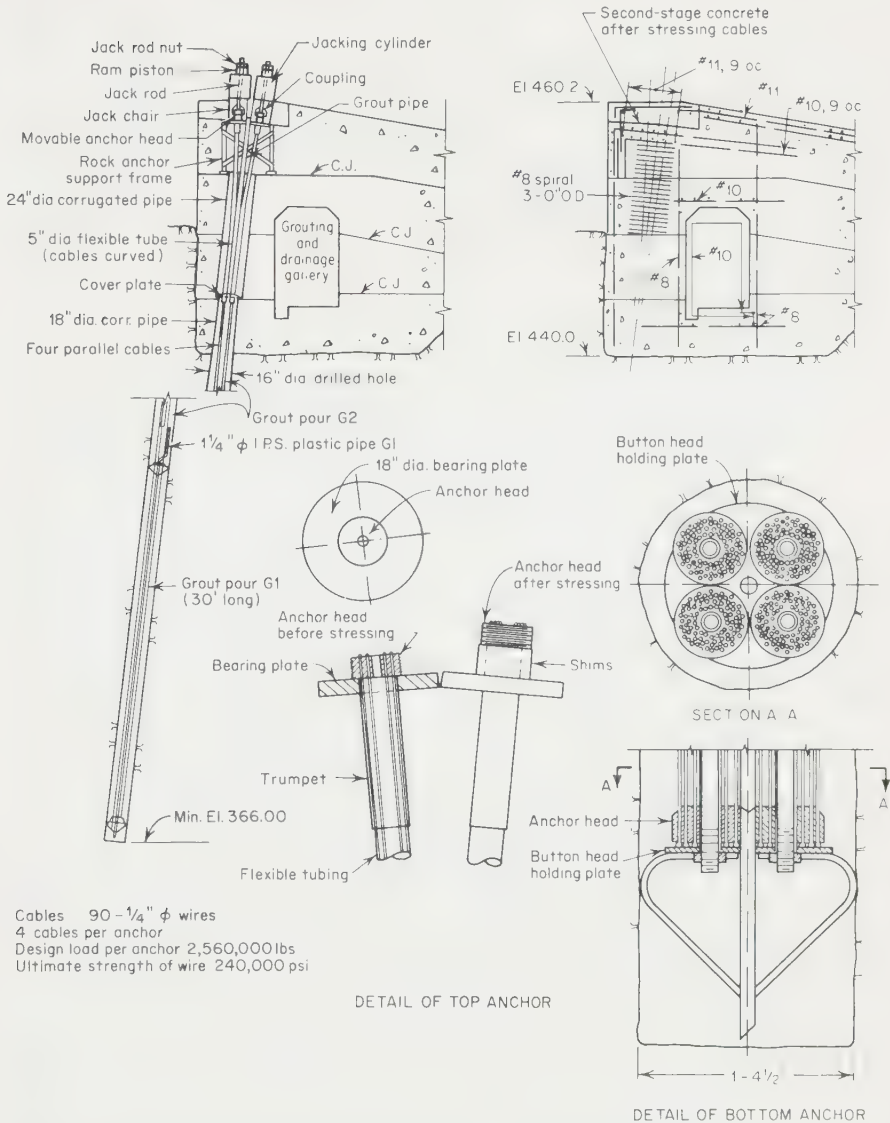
Wanapum intake structure. Details of the cable and its anchorage. Installation procedure: A. Drill hole at foundation level. B. Form hole in concrete. C. Lower complete cable unit into hole and support from rock anchor support frame. Make grout pour G1 and remove plastic pipe G1. D. Concrete 5-in. flexible conduits in formed hole. Enclose support frame. E. Stress cables. Place split ring shims. Remove jacks. Make grout pour G2.
